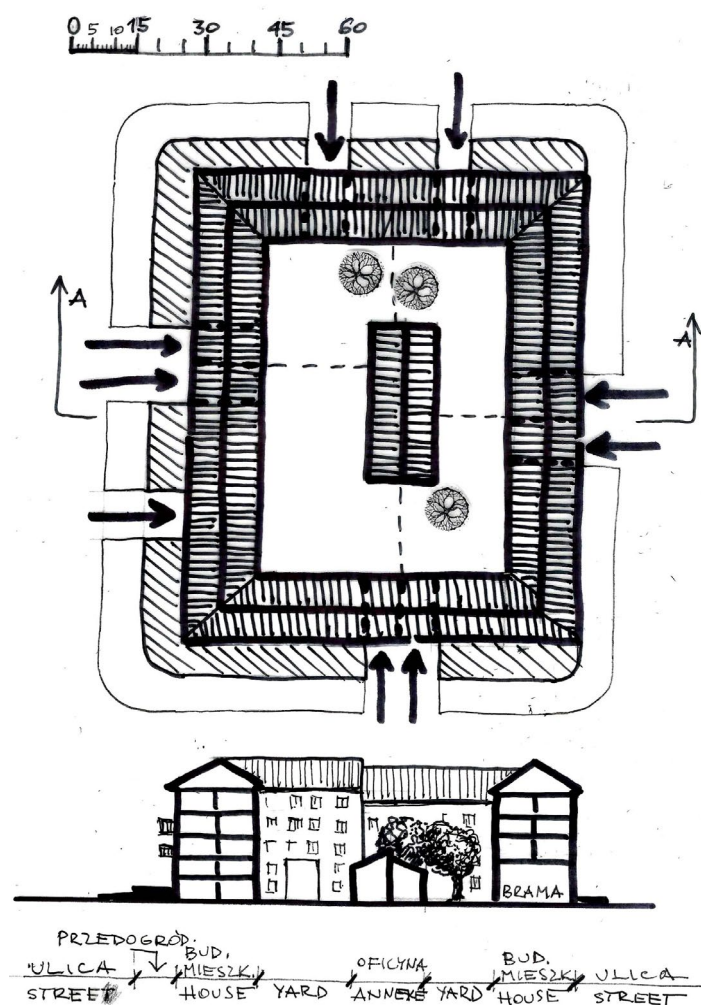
Backyard type A (plan and cross-section) (drawing I. Zalewska-Kantek)
